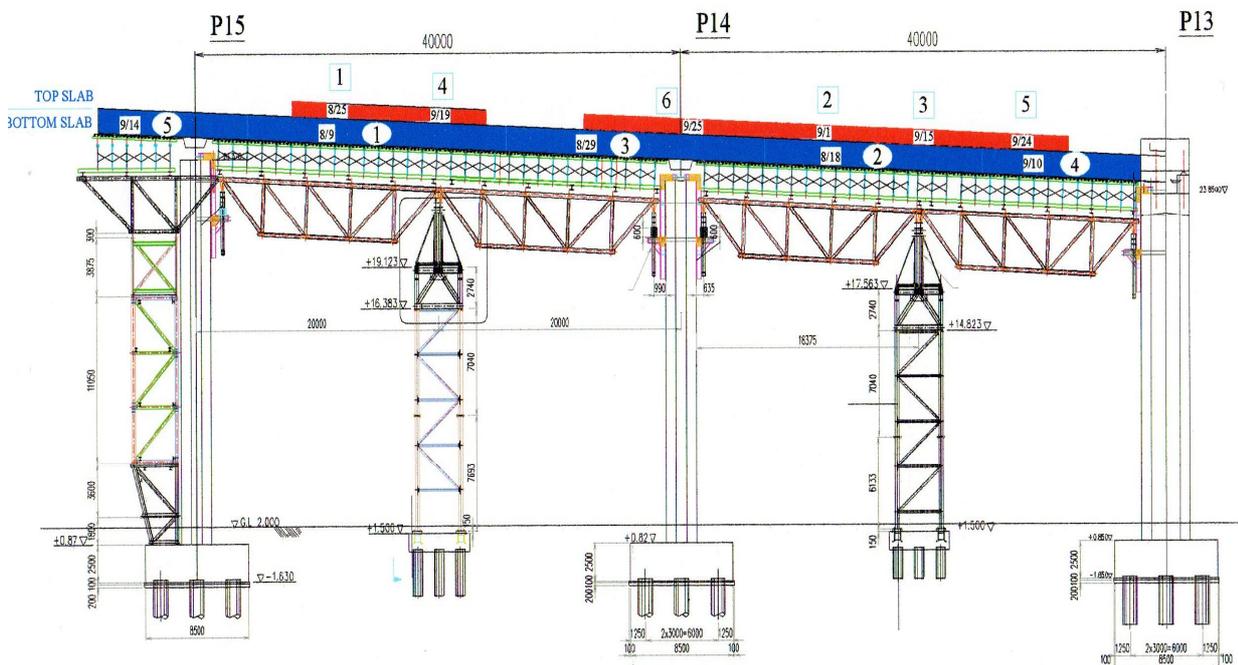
Scaffoldings and bents for prestressed concrete girder and order of segments to cast in (Shioi 2011)
